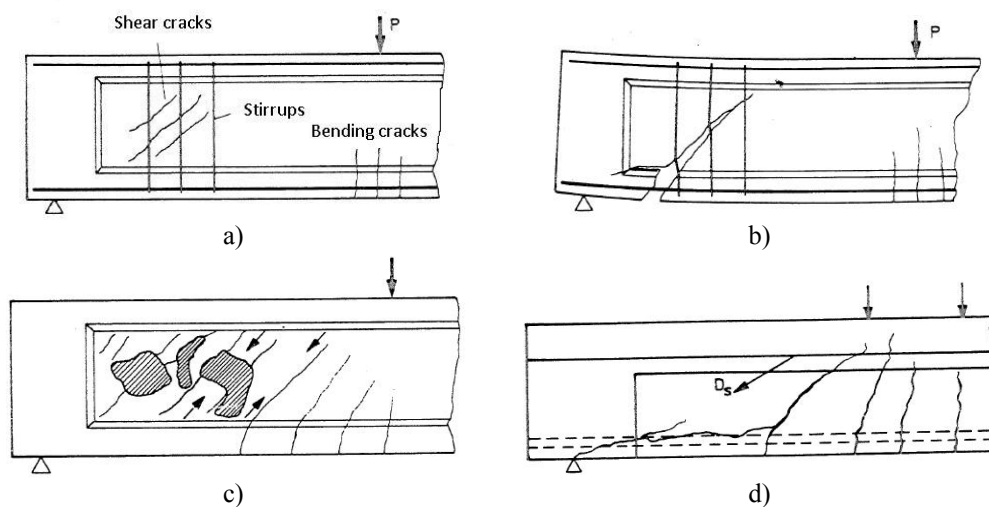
Shear in RC beams: a) cracking, b) diagonal tension failure, c) web crushing failure and d) anchorage failure (Leonhardt 1988)
